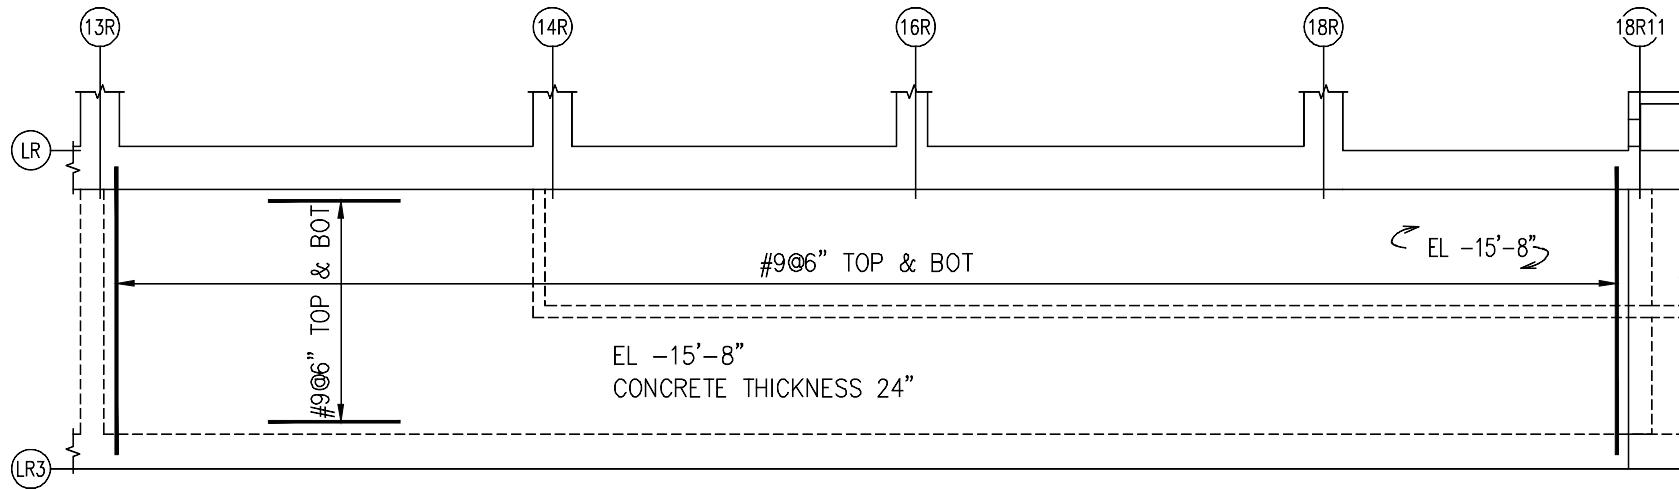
Typical Reinforcement in ESWPC Exterior Wall– SECTION 1
